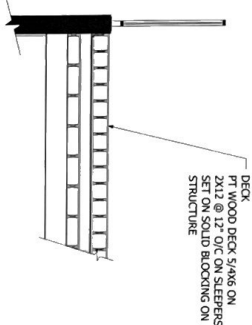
DETAIL SECTION AT ROOF 3/4" = 1'-0"
